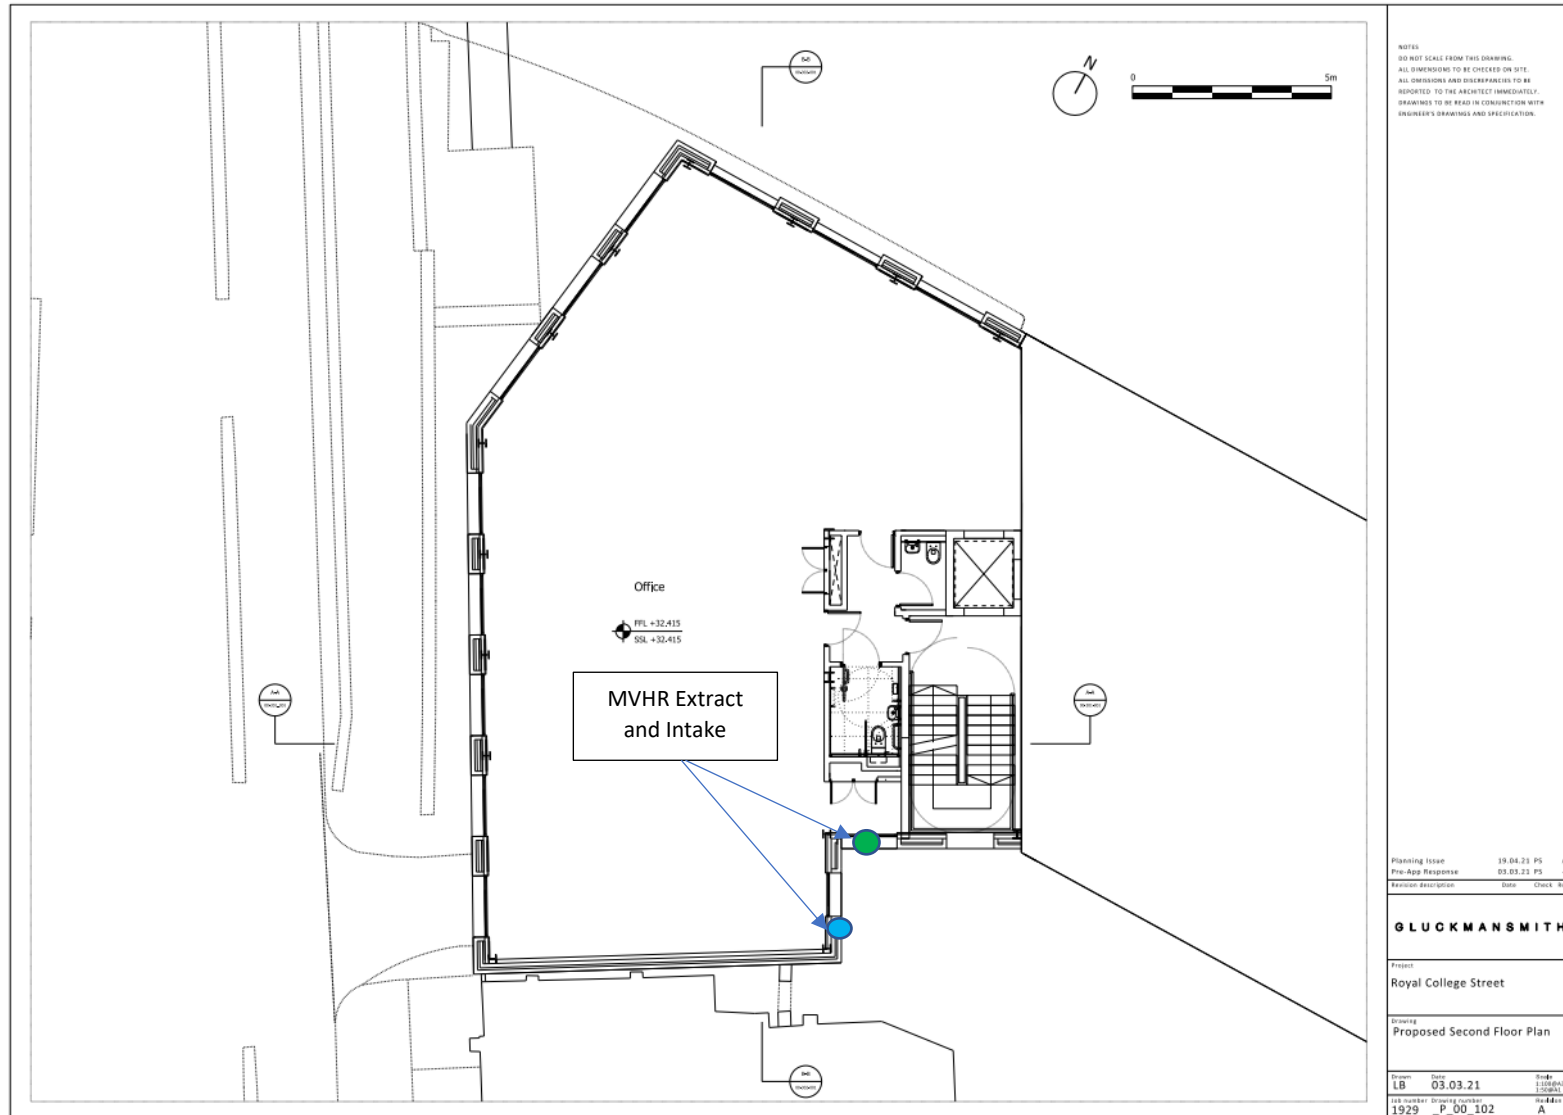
PROPOSED SECOND FLOOR PLAN
